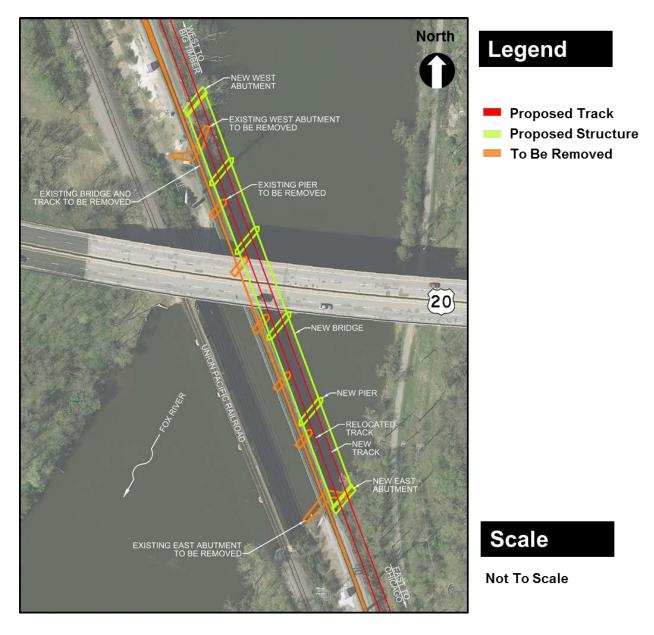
A: Components of Alternative 1A – Construct a New Double Track Bridge on New Alignment East (Upstream)
